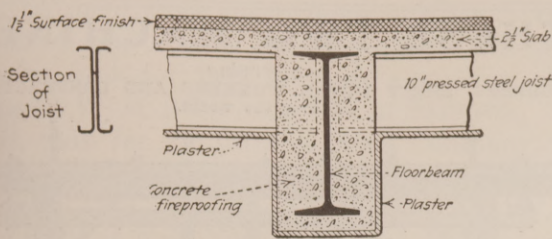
LIGHT WEIGHT FLOOR CONSTRUCTION.
